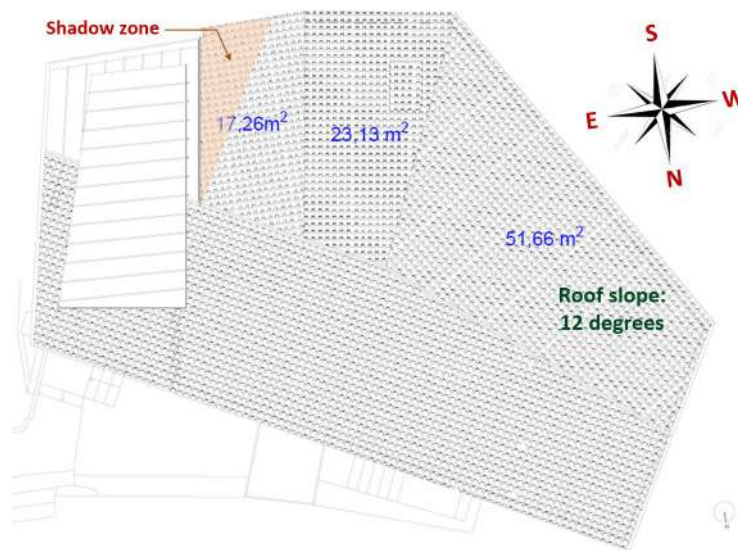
The Silk House roof with two suitable areas (South and Southwest oriented and slope of 12 degrees).
